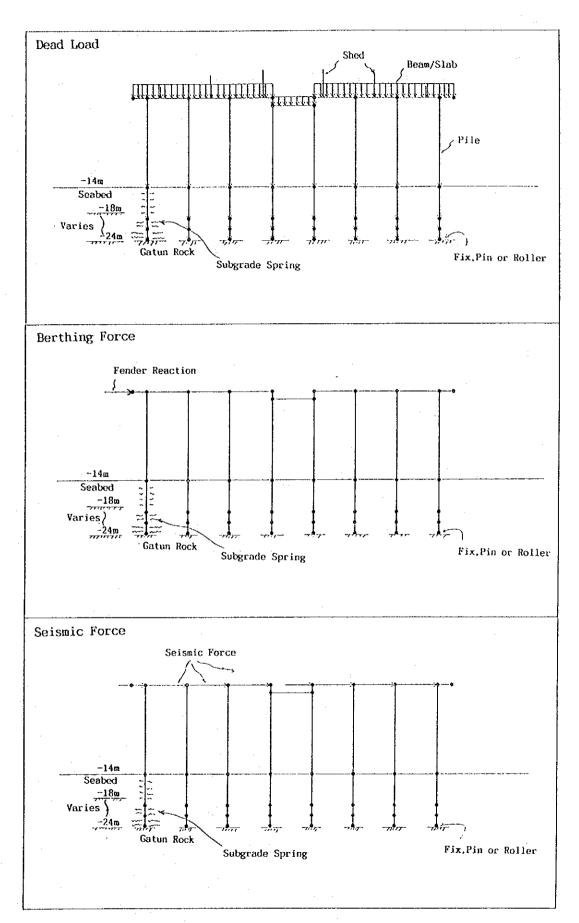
(c) Basic Loading Case: Pier No. 8
